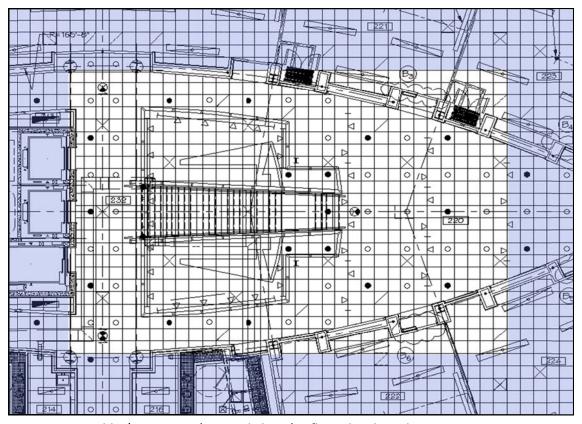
Lobby/ Main Stair | Second Floor | Reflected Ceiling Plan
